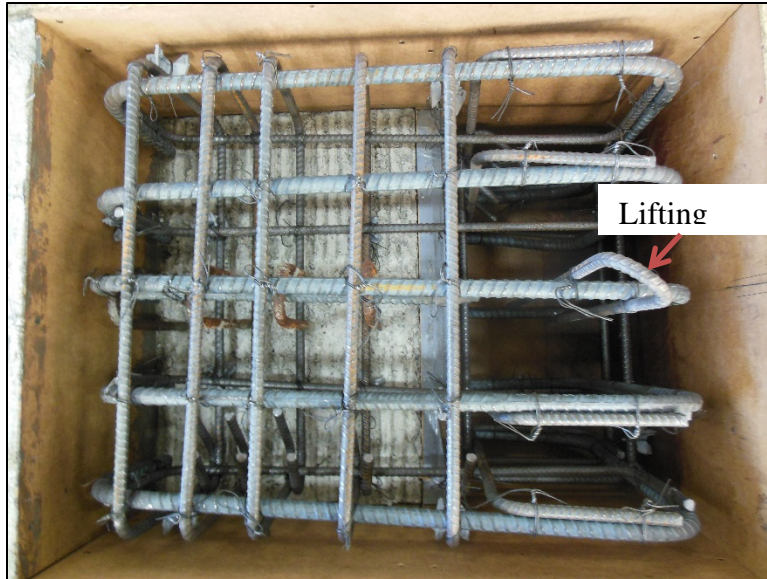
A #4 (#13M) L-shape installed in the top (side 1) side formwork
